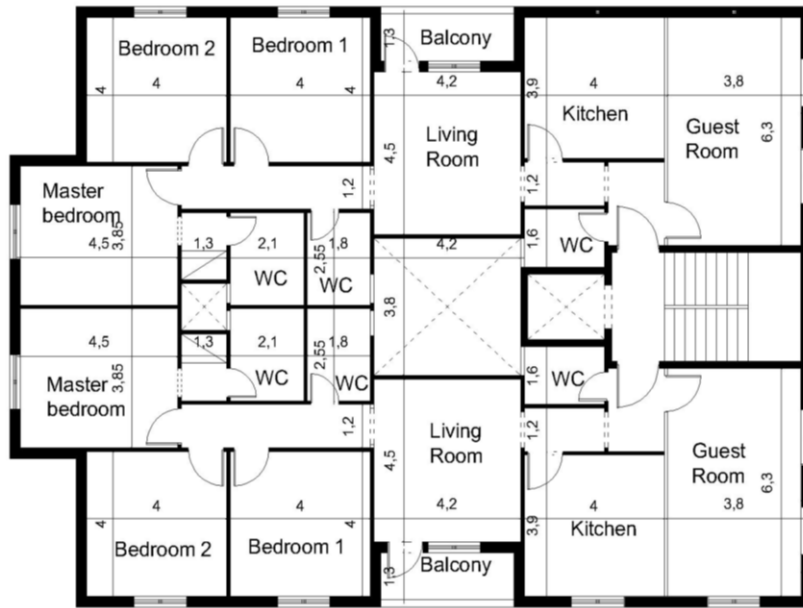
A typical floor plan for multi-family residential buildings in Jordan. Source of plan layout: (Goussous, Siam and Alzoubi, 2014a).
